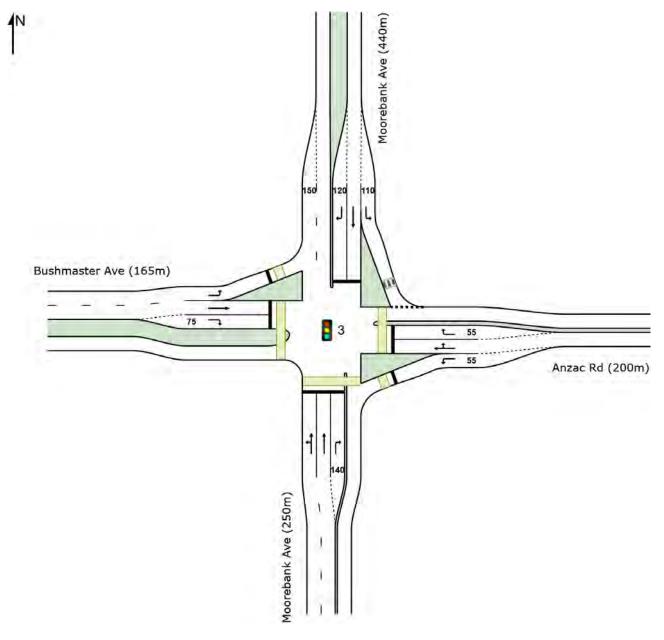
SIDRA Layout – Proposed Construction Access – Phase 3
